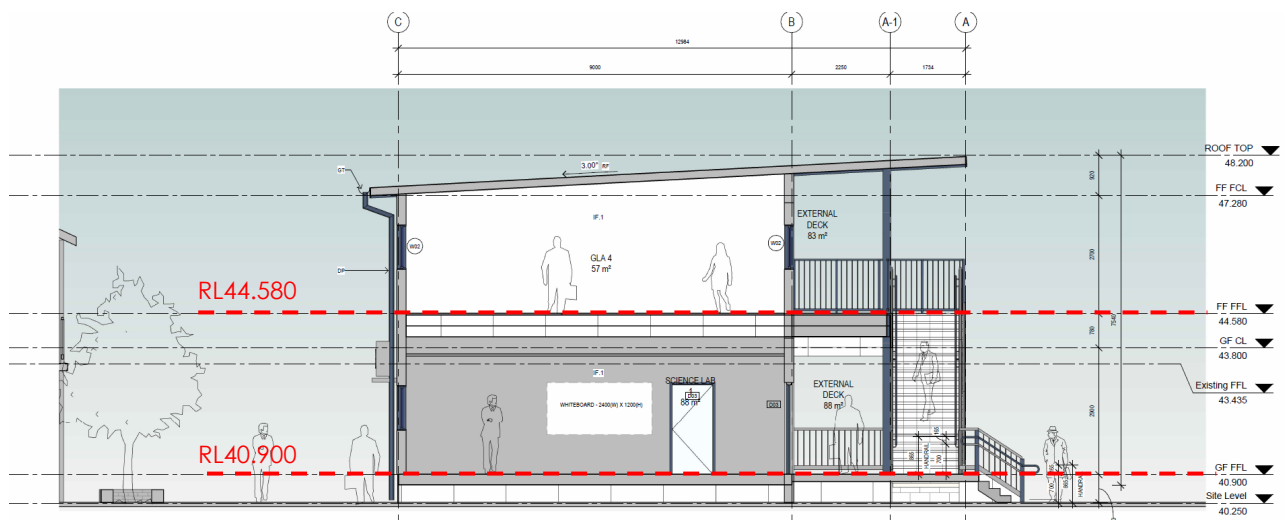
Section through the new building showing the finished floor levels (Source: Marathon Modular)
